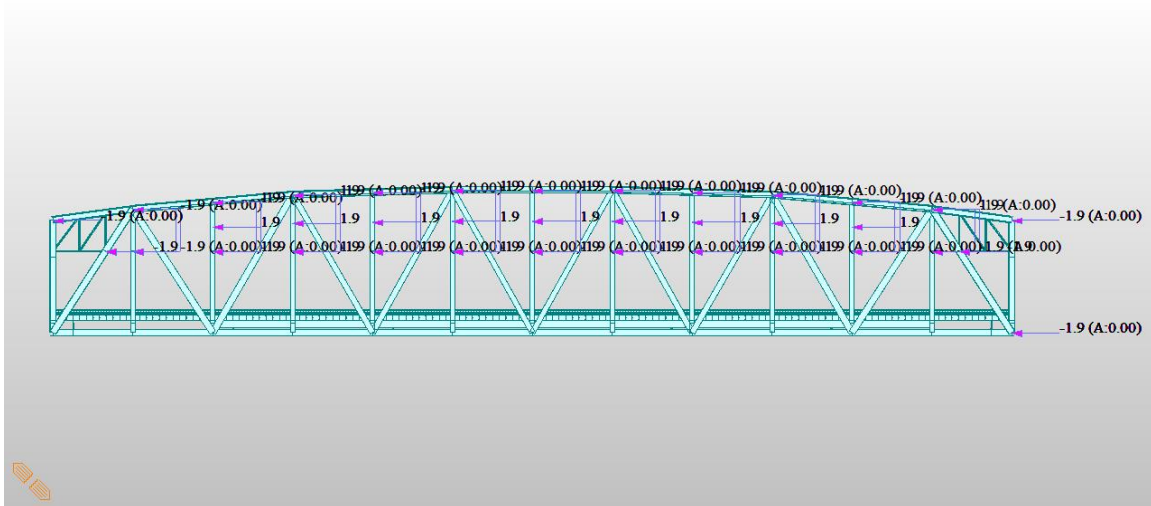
Bridge Raised with Longitudinal Wind Evaluation
